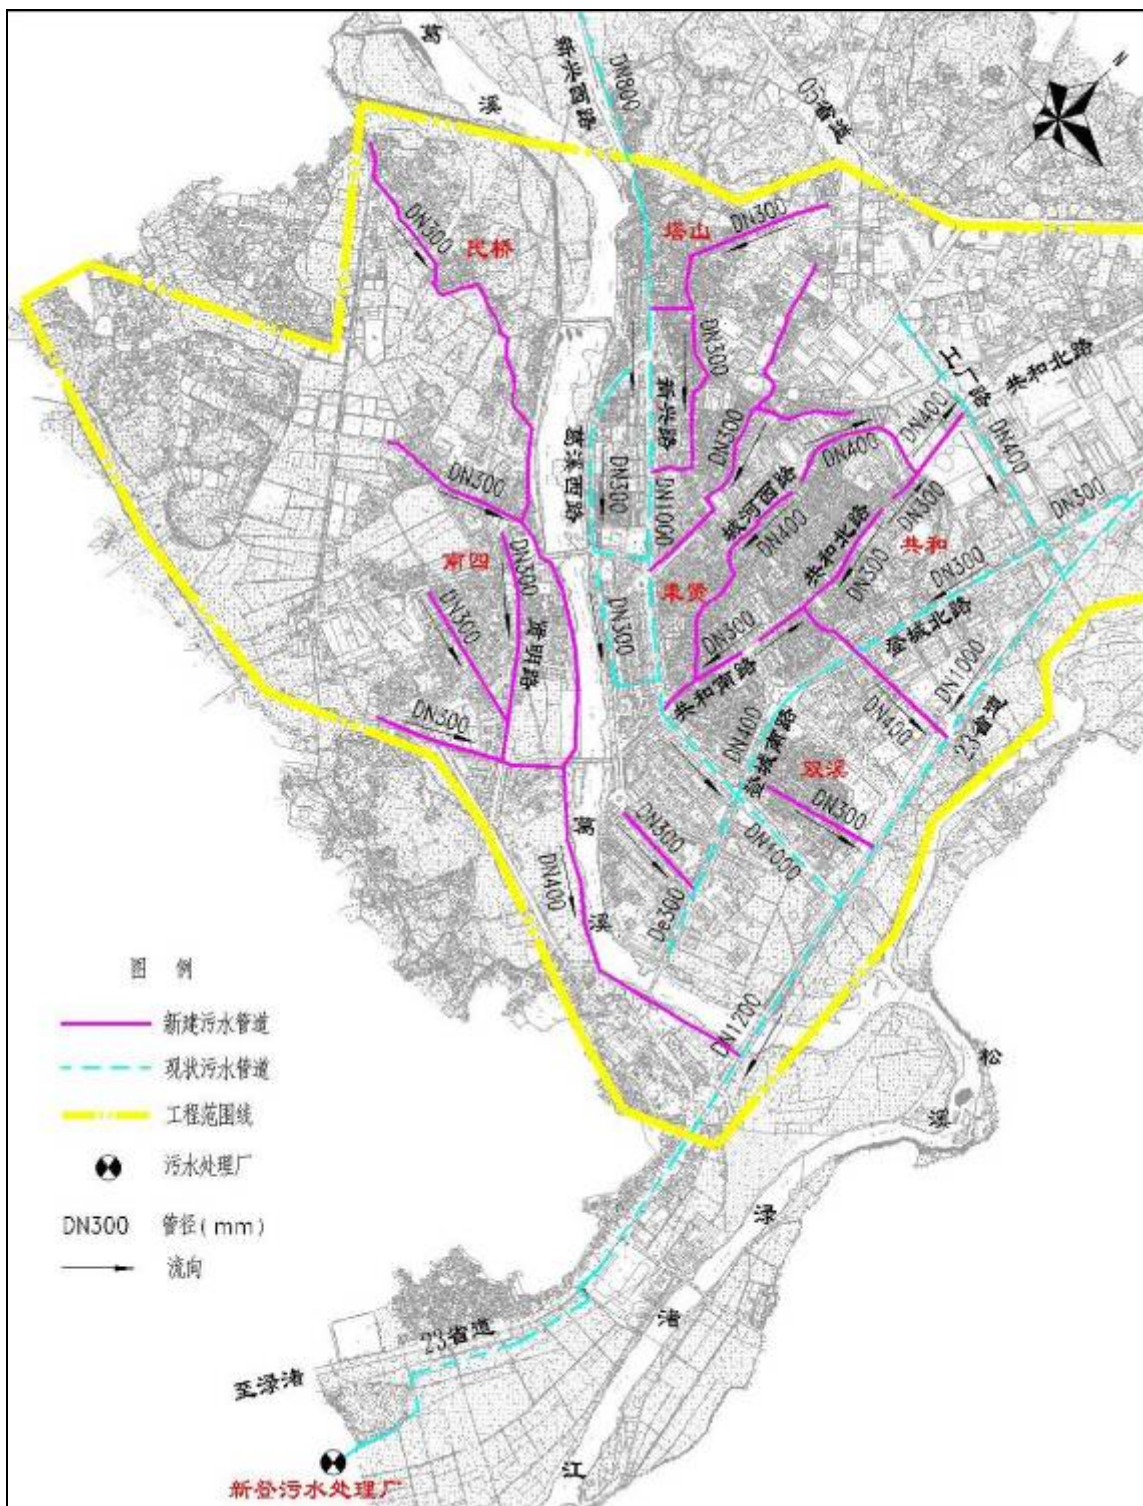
Layout Plan of Town Sewage Pipe Network of Xindeng Town, Fuyang City
